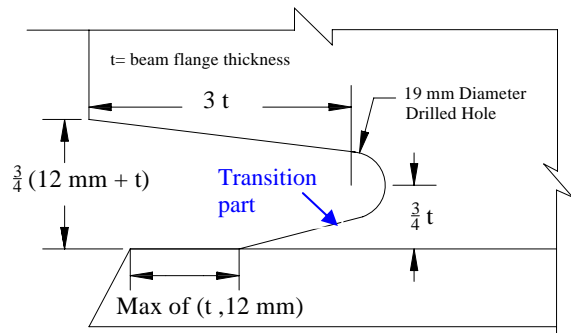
Modified weld access hole geometry proposed in reference [16]
